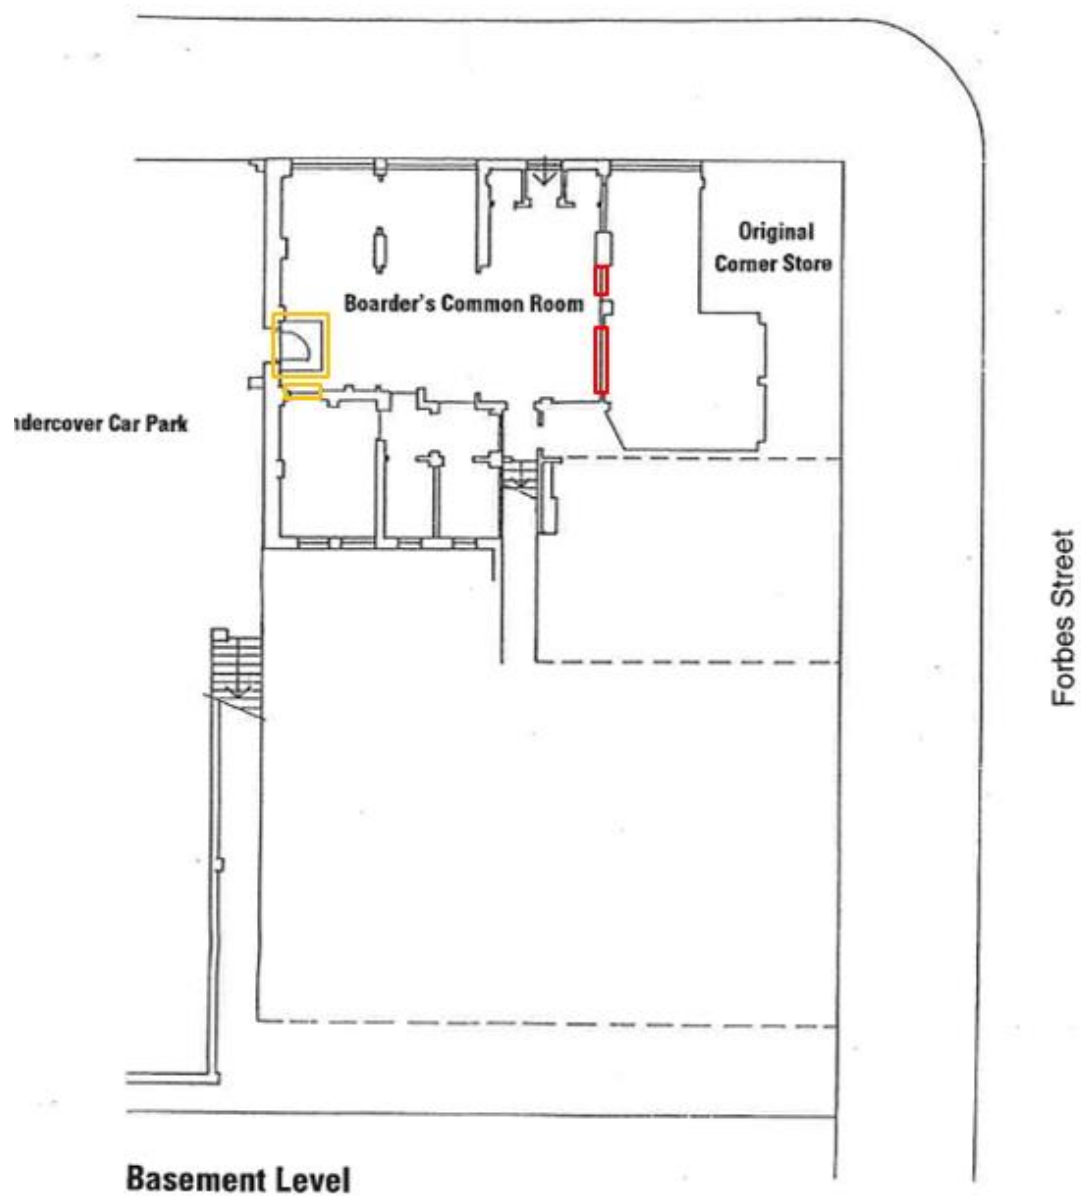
Basement plan of Wilkinson House in 2001, as compiled in the 2001 GML CMP. Walls demolished since 2001 have been highlighted in red.
